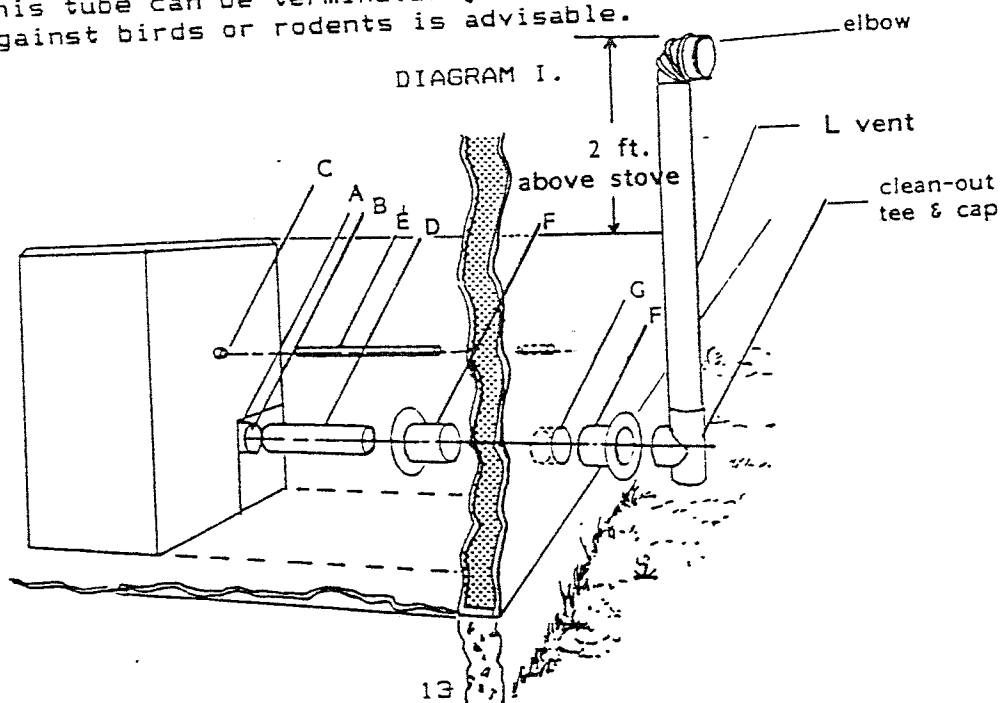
DETAILED INSTRUCTIONS FOR CORRECT EXHAUST INSTALLATION:
